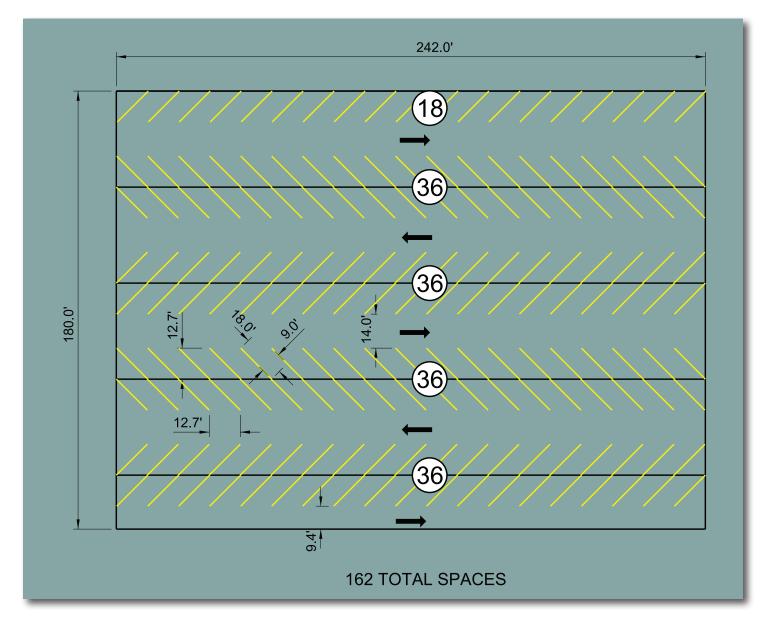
Example design for 162 parking spaces per acre with 9' by 18' angled spaces and one-way traffic lanes.
